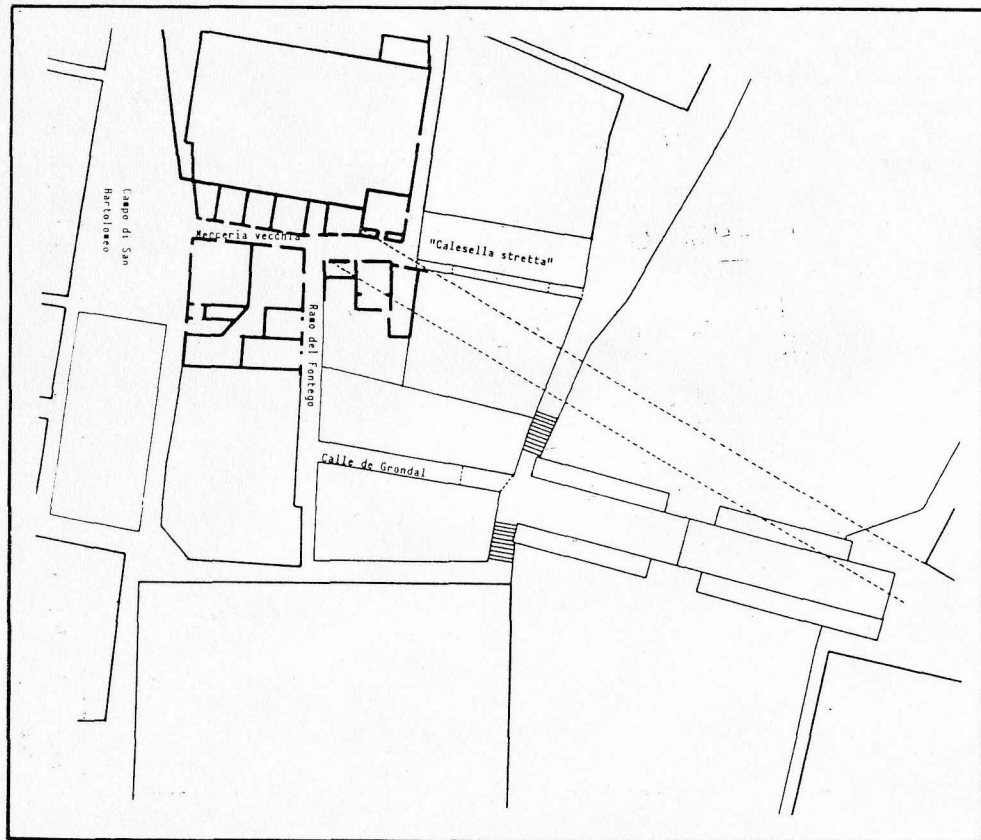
The Rialto Bridge: plan showing the position of the wooden bridge, and the proposed new stone bridge (dotted line), as described by the Senate in 1587 (Author's elaboration)
